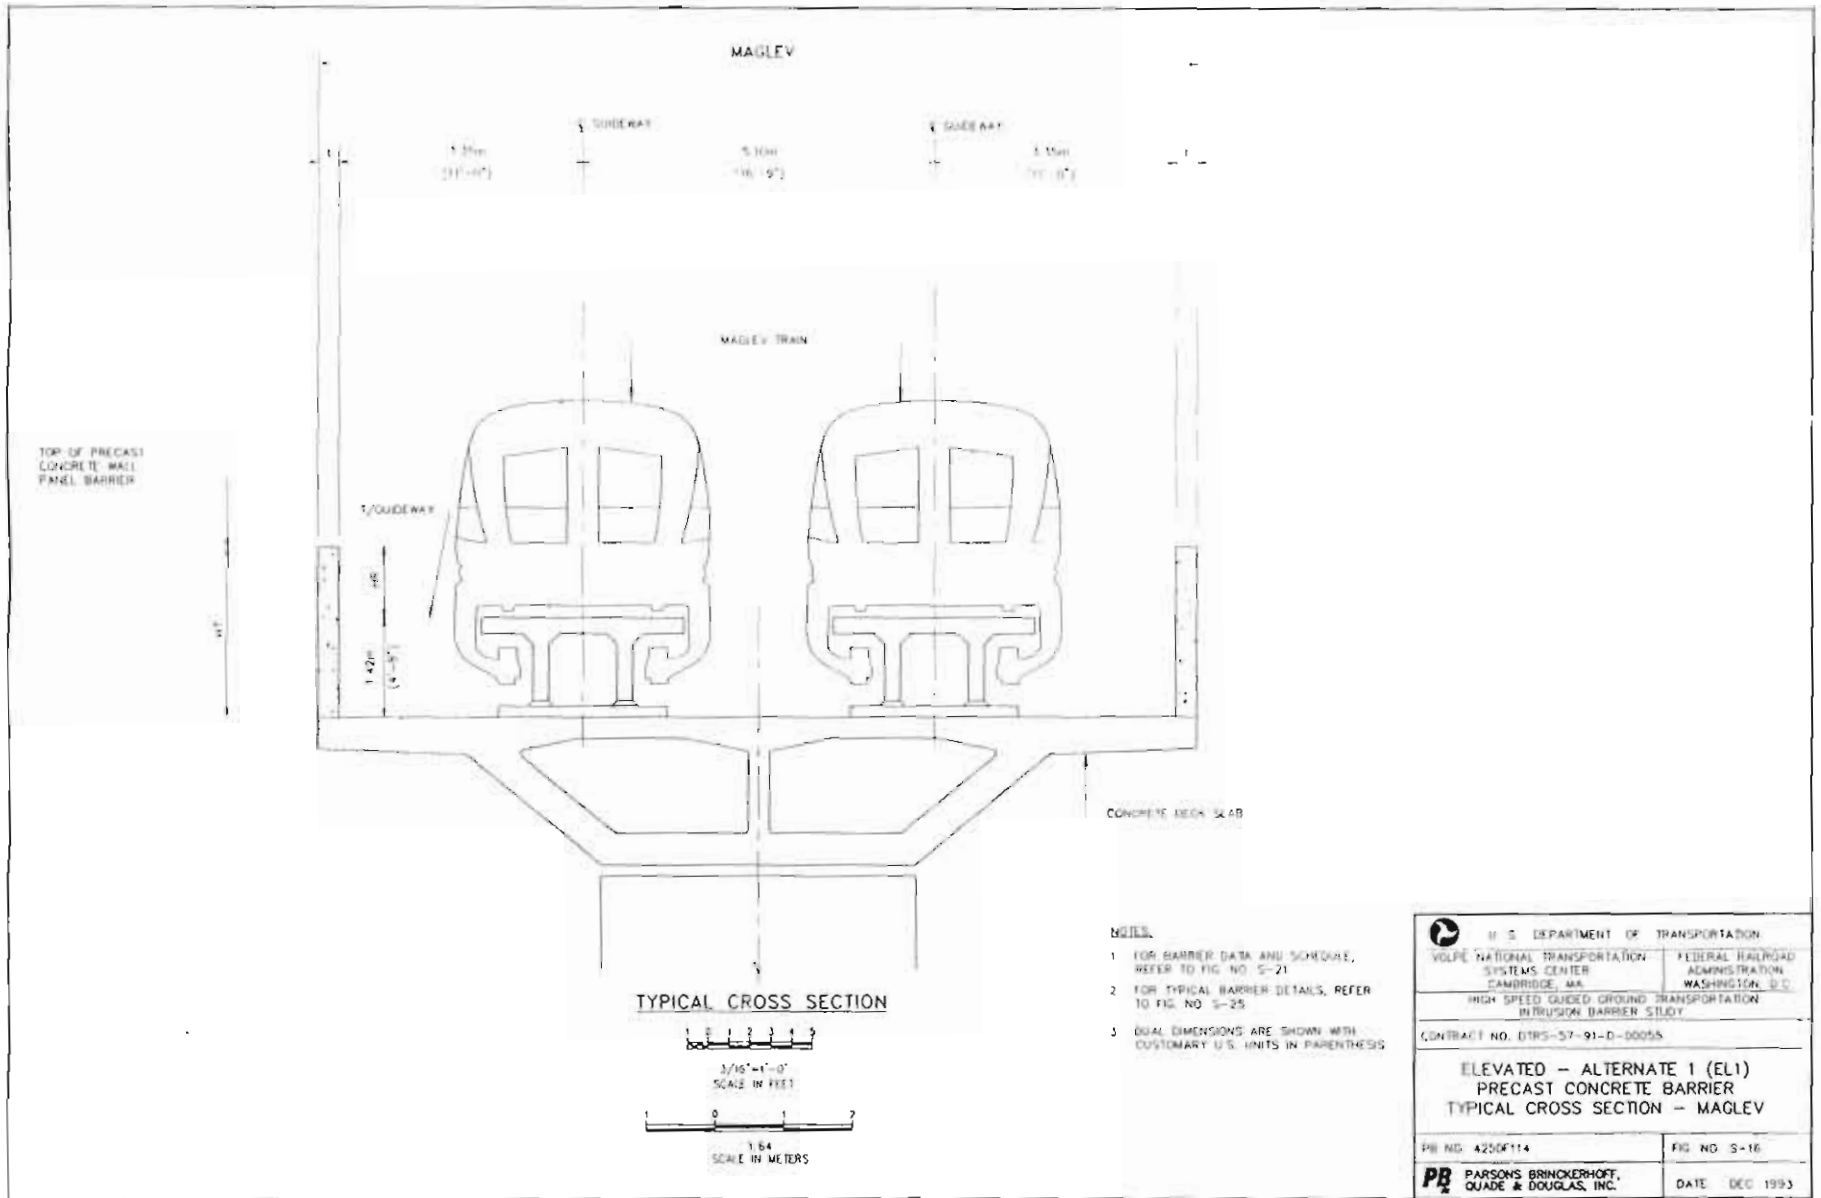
ELEVATED ALTERNATE 1: PRECAST CONCRETE WALL - TRANSVERSE SECTION/MAGLEV
